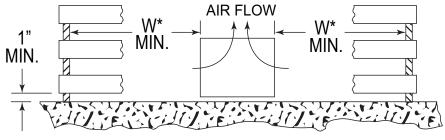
Remote ACC Installation When Installing Units in Pits
